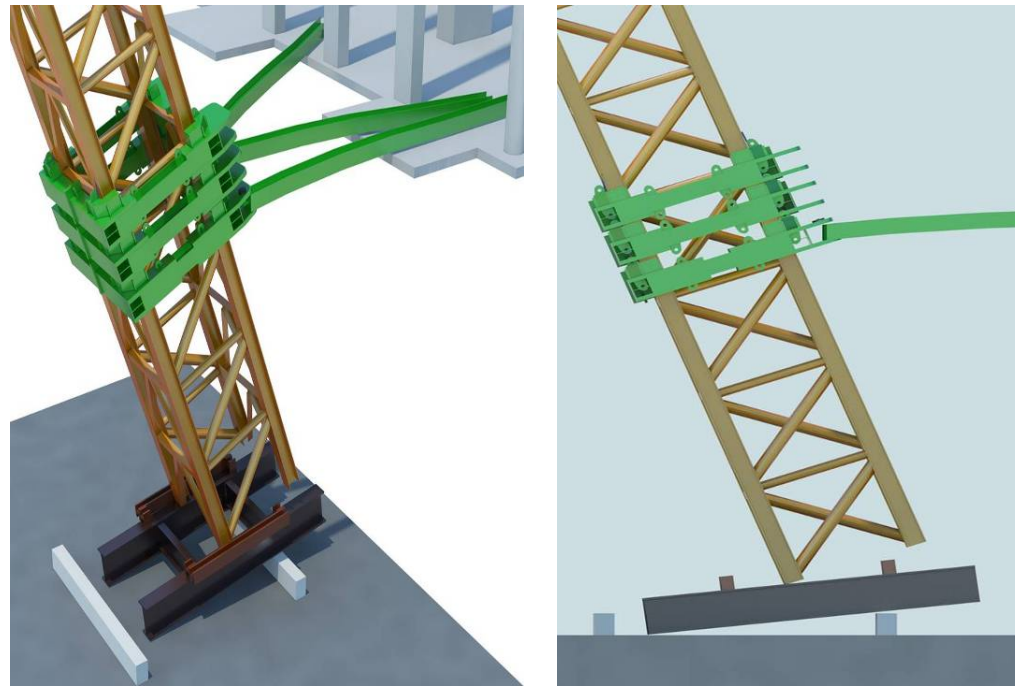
Elevation of the tower at the 3rd floor showing dunnage slippage at the base and the uplift at the back legs of the tower and tower rotation. Prepared by Arup.
